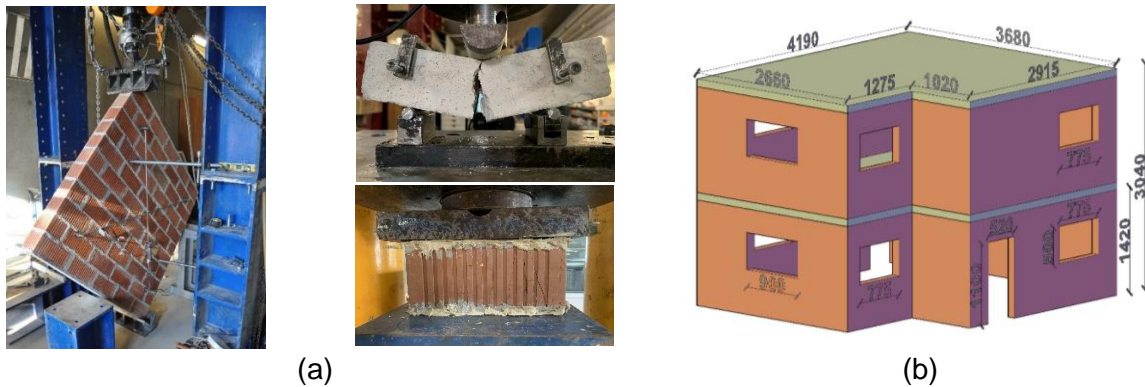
(a) Material characterization tests performed on masonry wallets, mortar, and brick units; (b) configuration of the half-scaled building for the quasi-static test.
